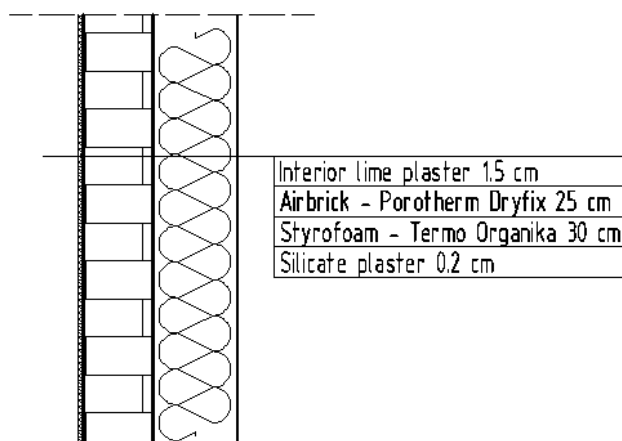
Structure of the exterior wall covered with plaster.
